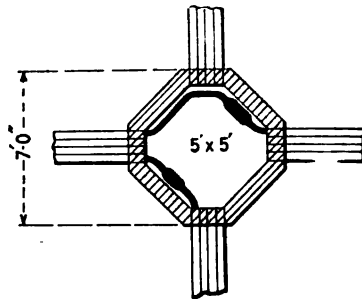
PROPOSED ARRANGEMENT OF MANHOLE
